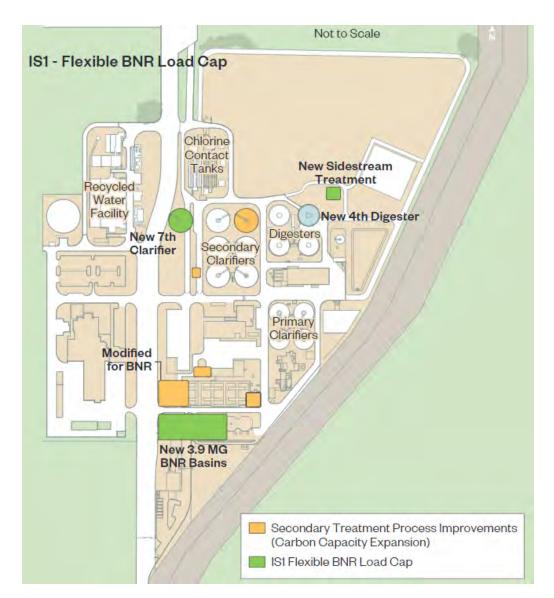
Site Layout for Load Cap (IS 1 - Flexible BNR)
